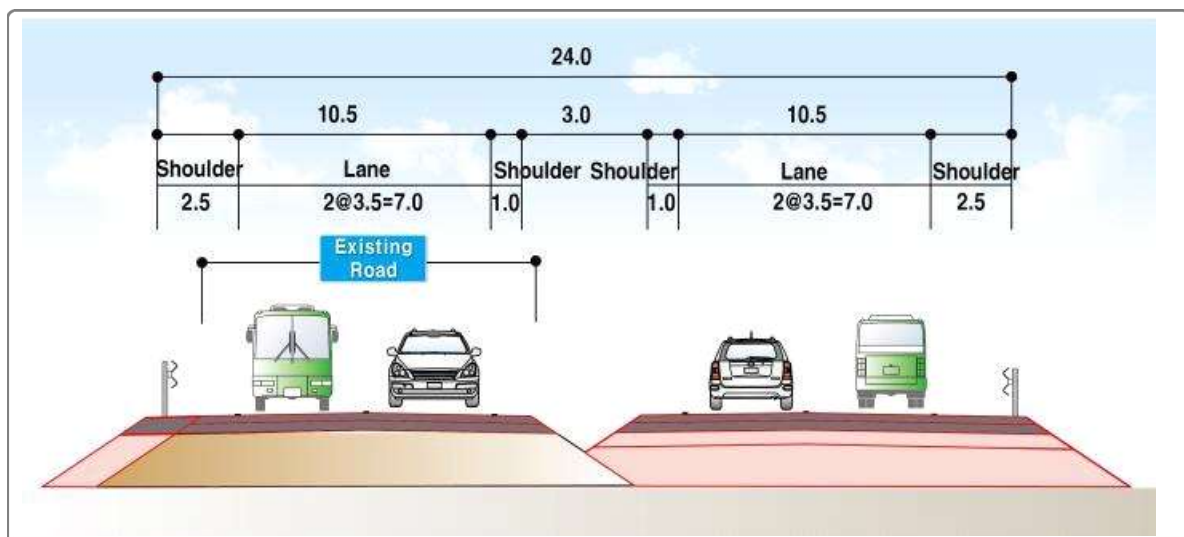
Standard cross-section: Urban (Sta. 9+846 -13+606, 14+256-16+600)
